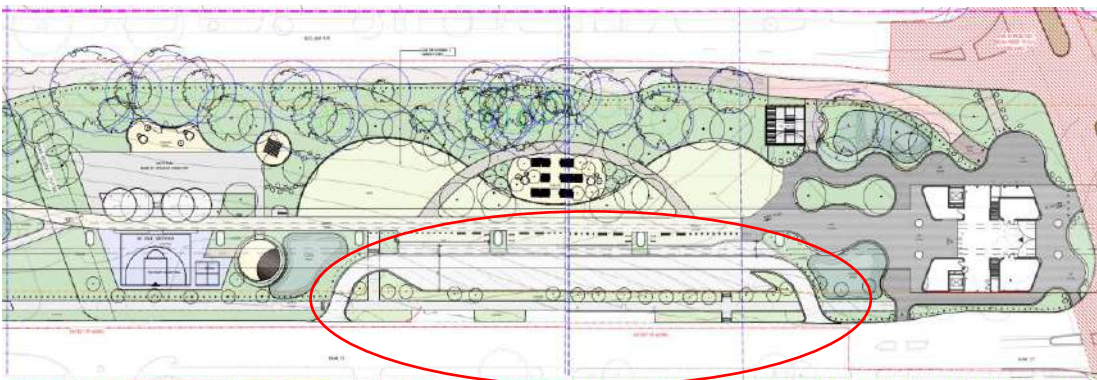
OATS STREET STATION CAR PARKING LOCATION 2
